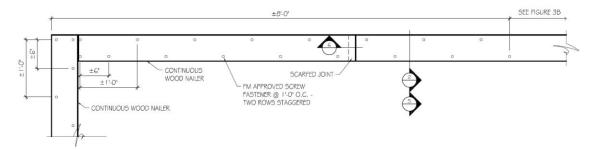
A - WOOD BLOCKING CORNER ANCHORAGE 8'-0" FROM CORNER
